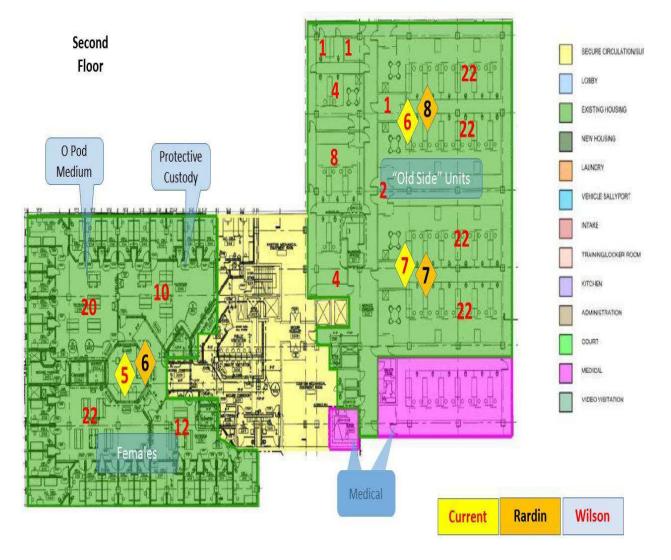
Second Floor Plan, Current Jail, with Staff Posts Identified.
